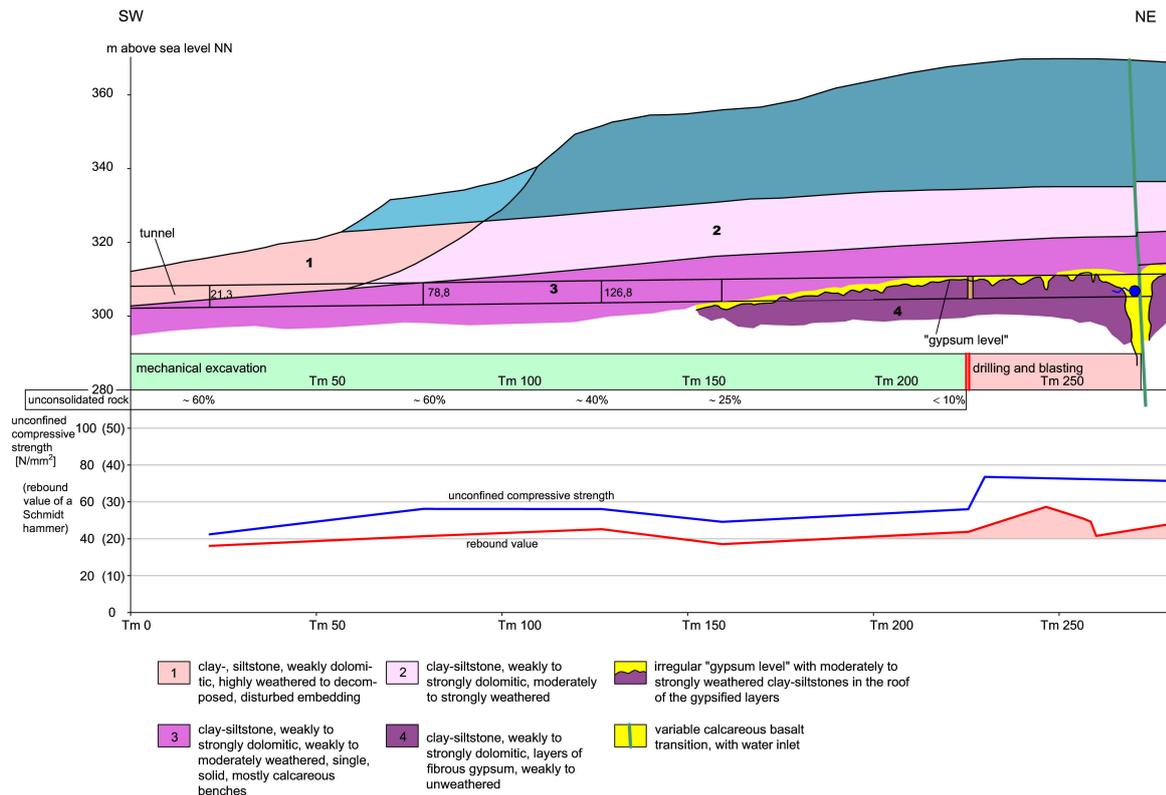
Extract of the tunnel geology from tunnel metre 0 (west portal) to tunnel metre 280
